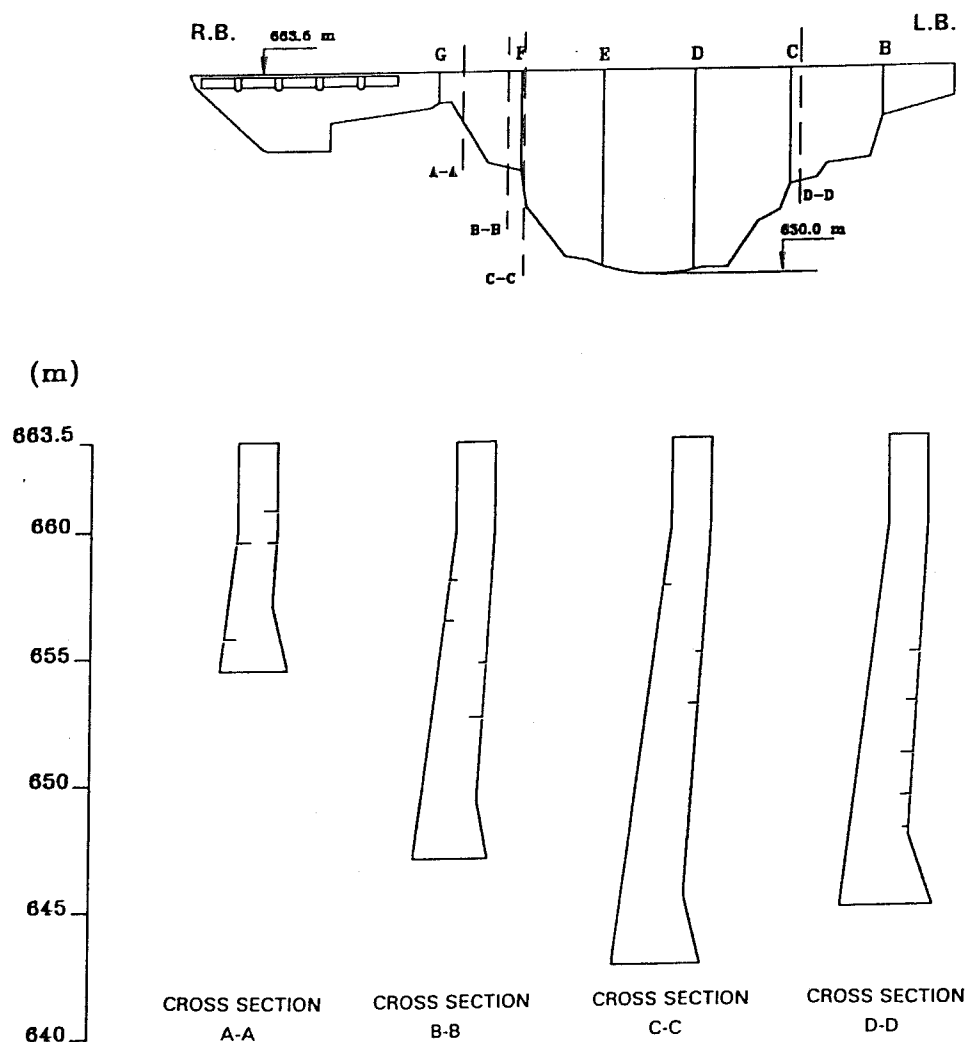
Alto Ceira dam. Depth of the main structural cracks. Vertical sections in blocks BC, EF and FG.
